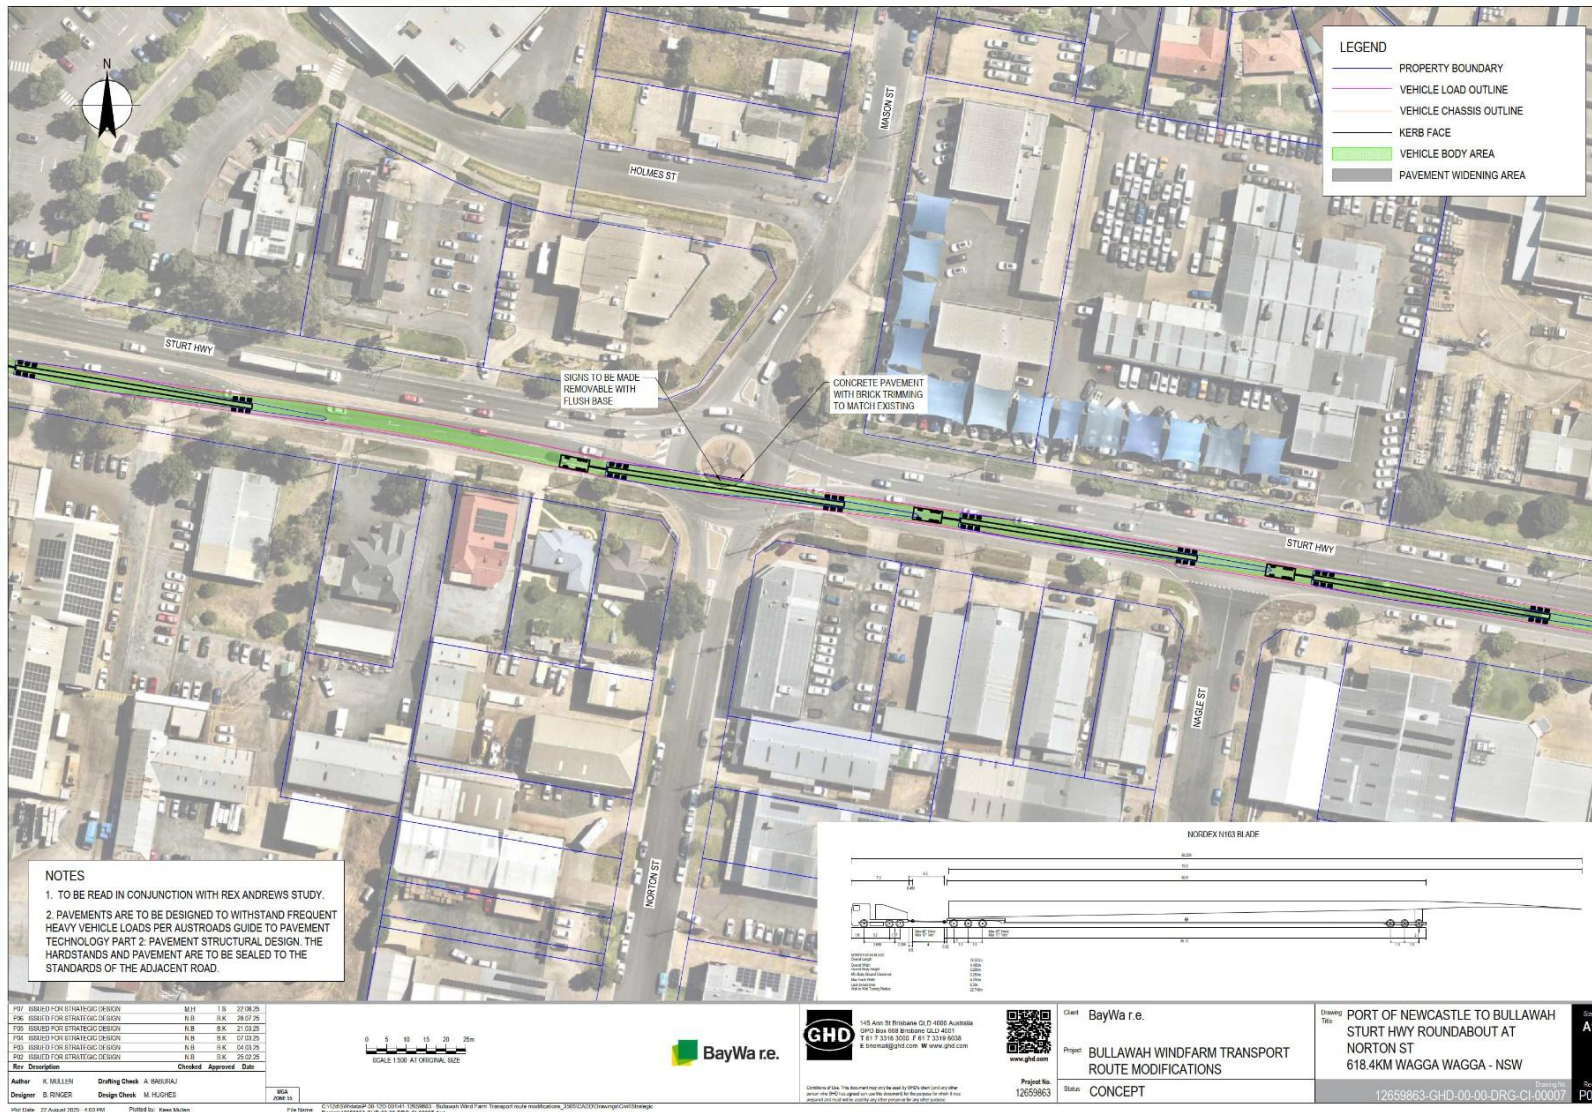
Wagga Wagga – Roundabout at the corner of Mason Street / Norton Street and Hammond Avenue (Sturt Highway)
